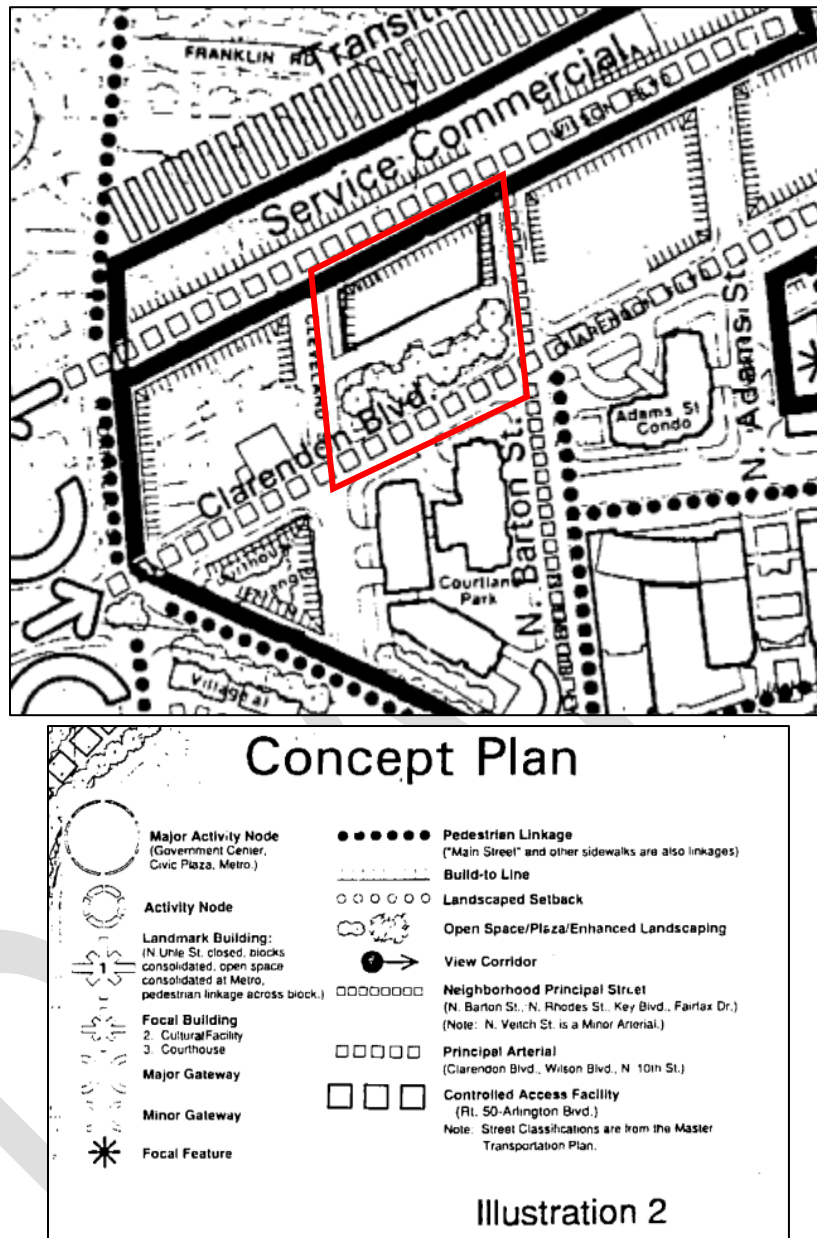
Courthouse Sector Plan Addendum Concept Plan
